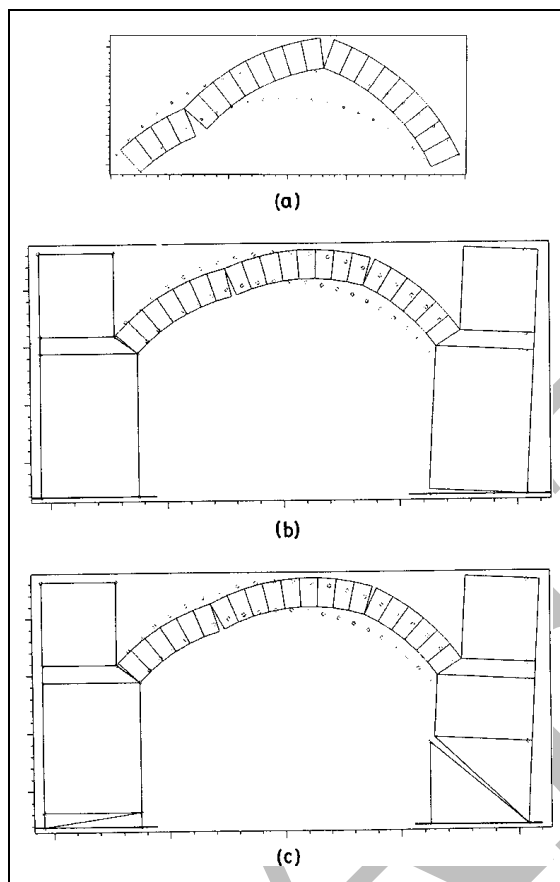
Collapse mechanism: a) arch; b) arch on rigid abutments; c) arch on fractured abutments (Ochsendorf et al. 2004).
